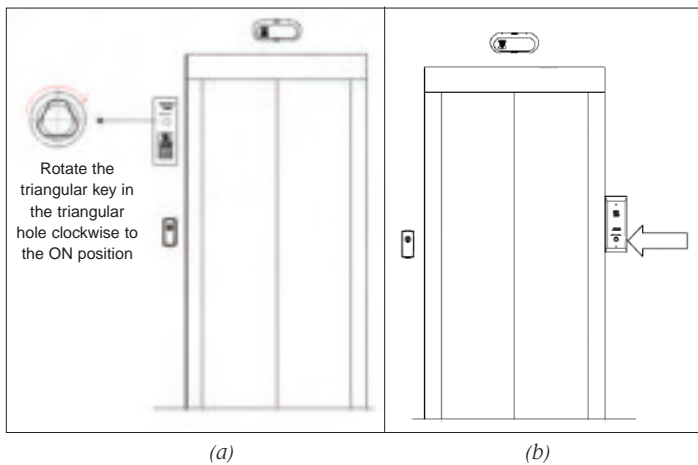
(a) Elevator evacuation control switch at the main exit floor (along with master station of elevator evacuation communication system) (Courtesy: Drucegrove, the U.K.); (b) Slave station of elevator evacuation communication system at upper floors.
